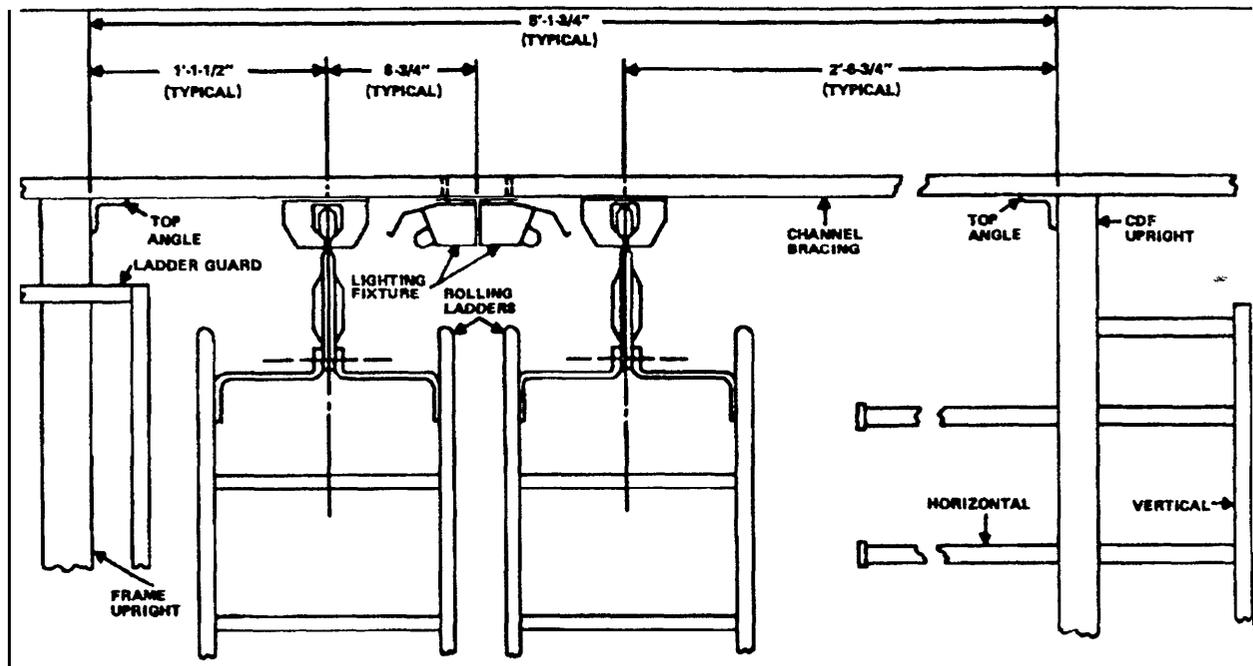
Typical Placement of Lighting Between Equipment and Distributing Frames
